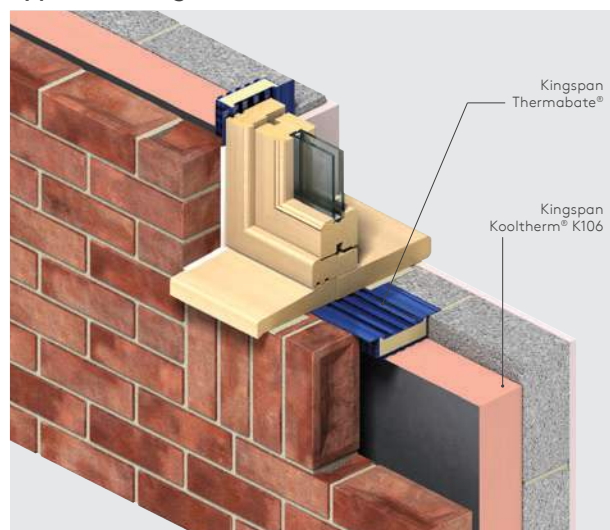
Kingspan Thermabate® in a Masonry Cavity Wall Construction with Kingspan Kooltherm® K106 Cavity Board
